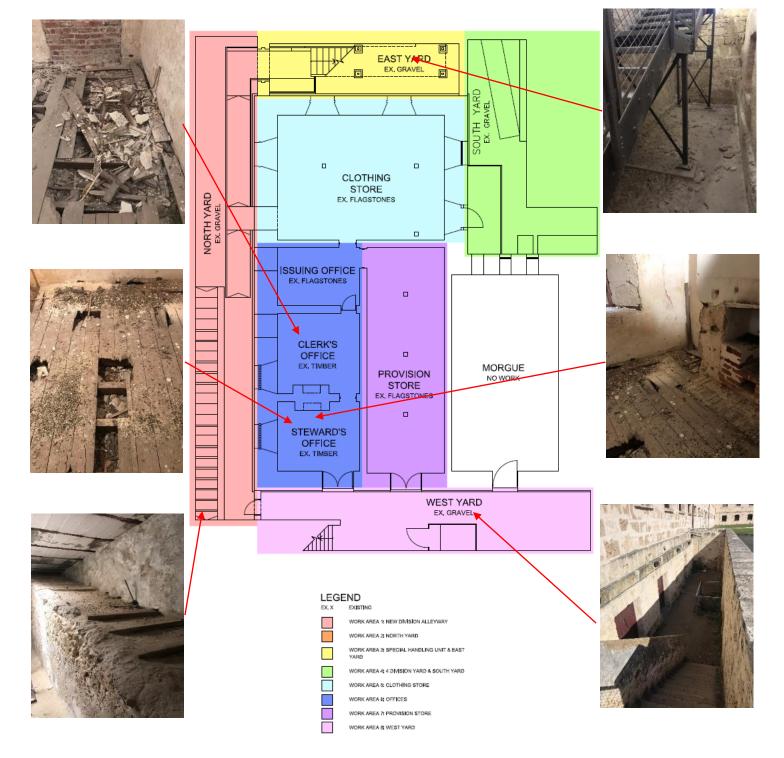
Floor plan of the proposed works – ground floor (Image Source: DPLH, Archae-aus)
